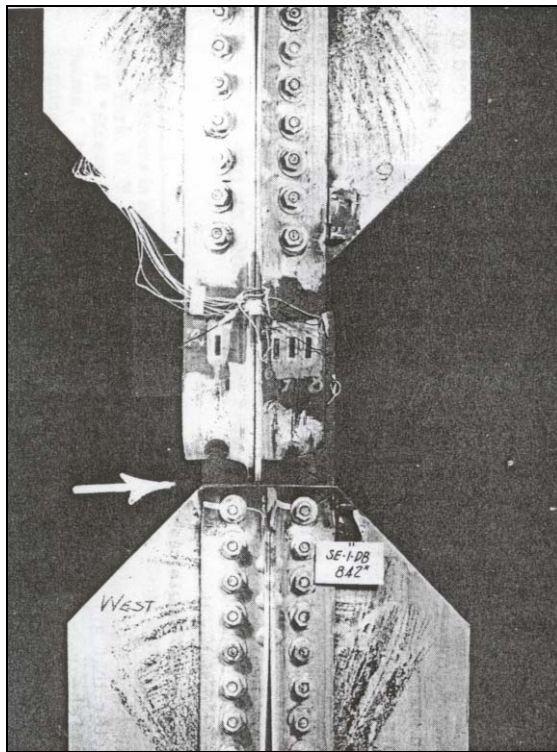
Typical Truss-Type Specimen Following Failure (Chesson and Munse, Behavior 1958)
